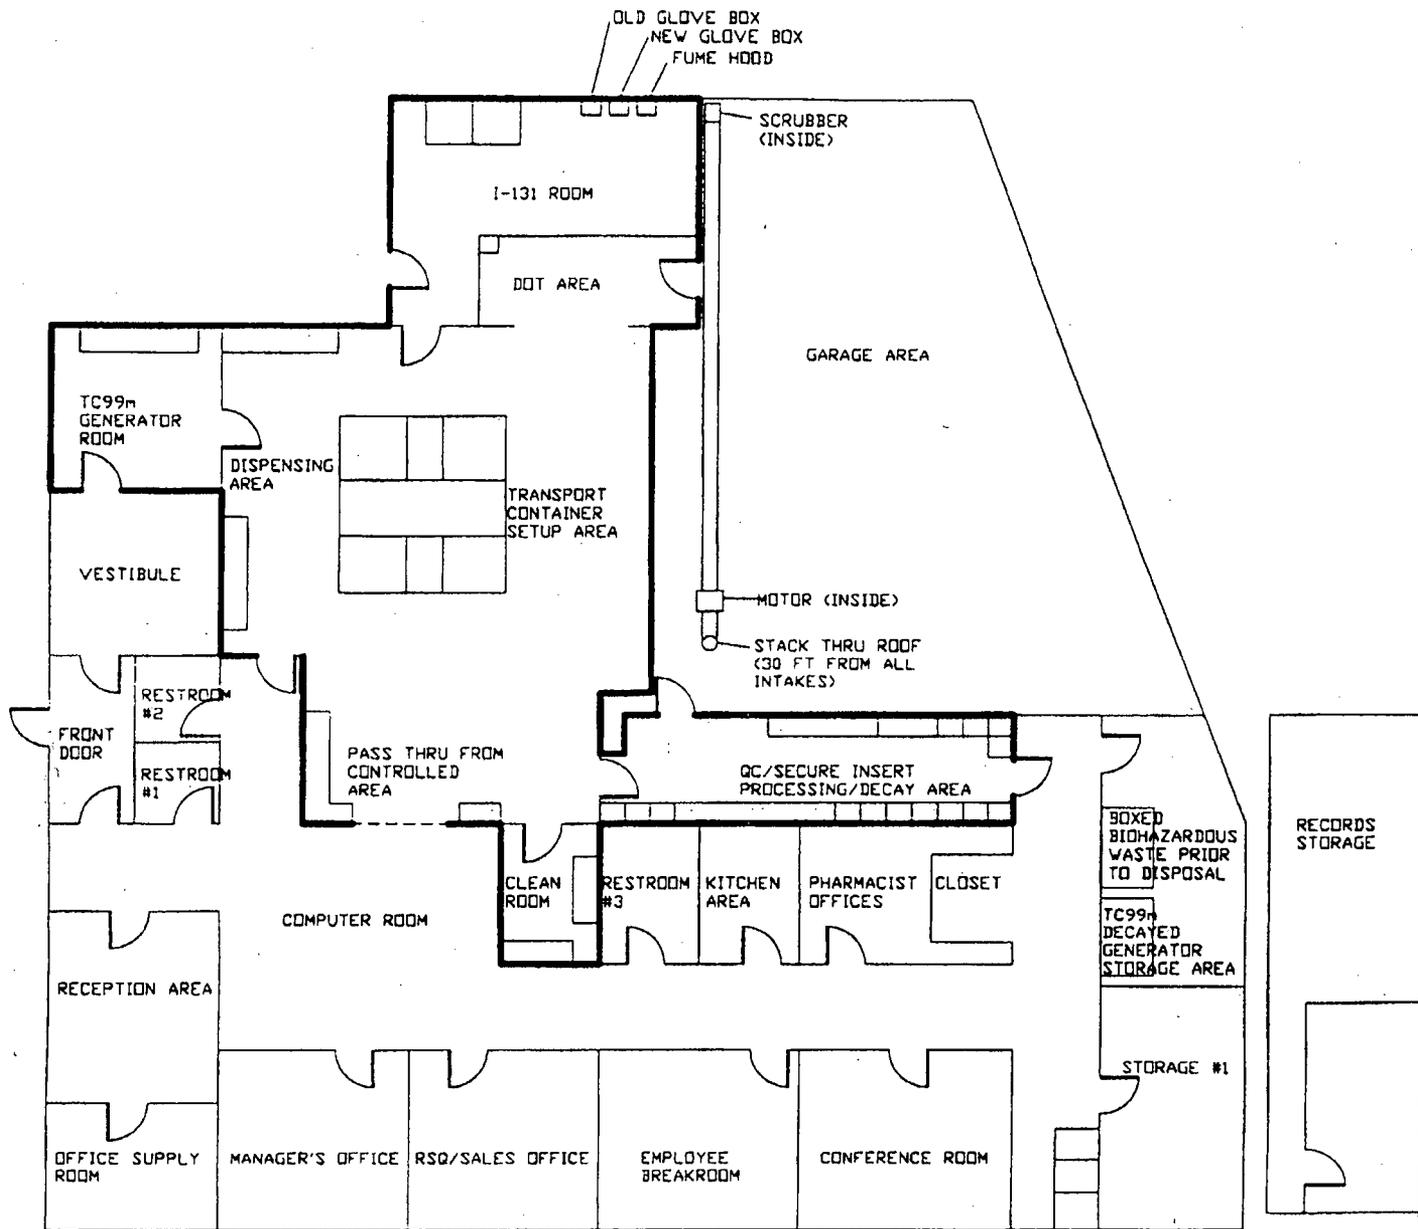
Facility Floor Plan The restricted area is outlined in black.
